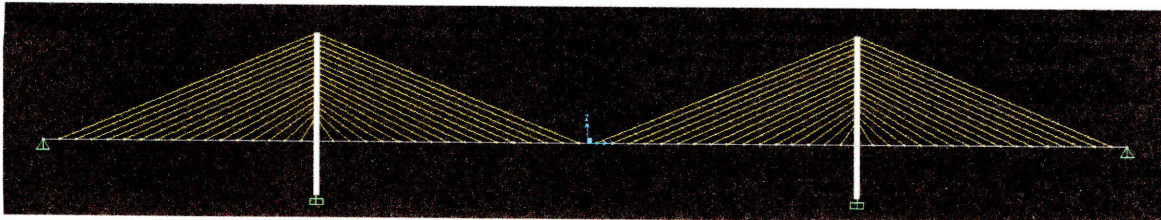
Symmetrical cable-stayed bridge about the y (transverse) axis of the horizontal plane
